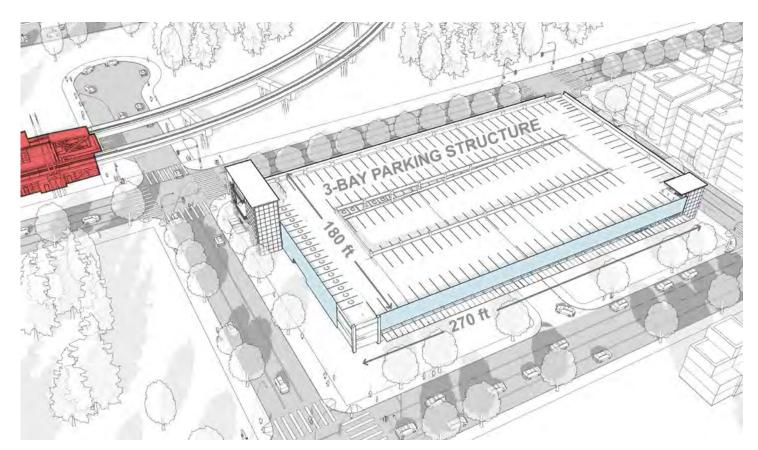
A - Stand-alone, 3-bay parking garage structure
